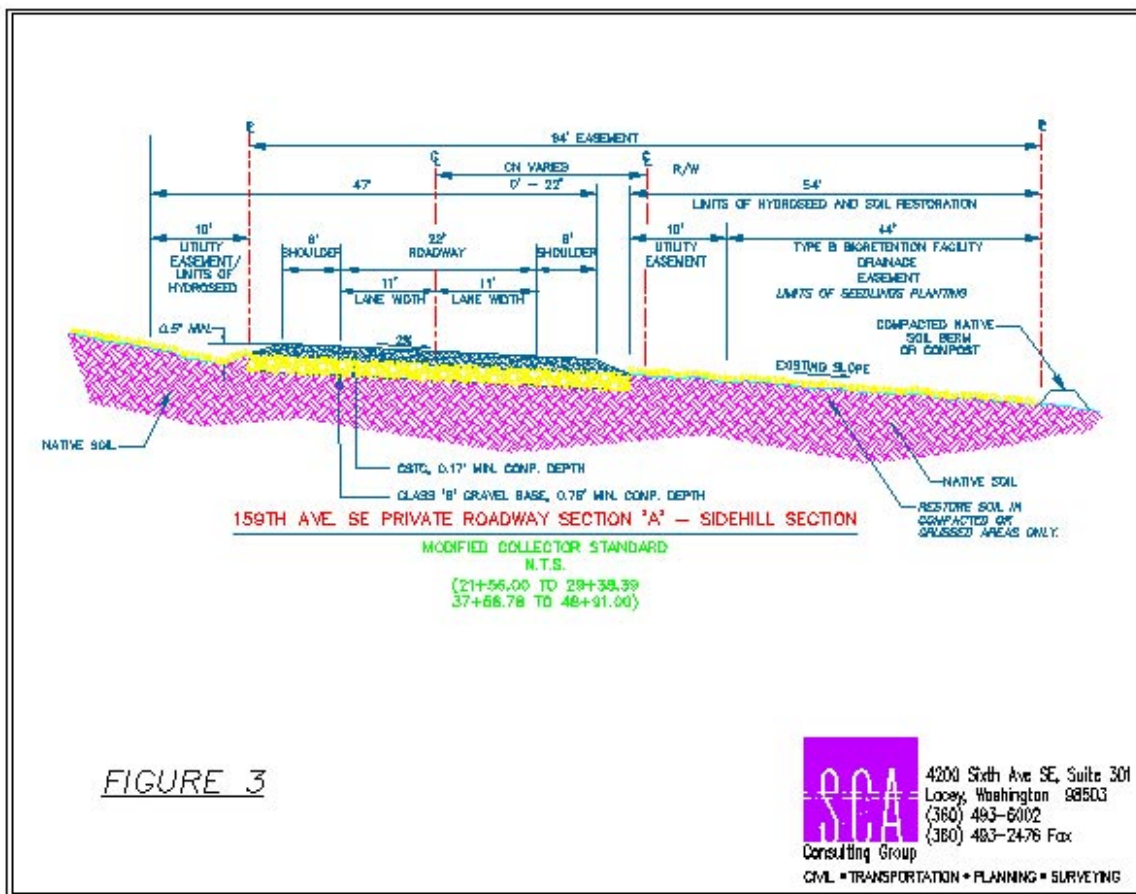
On sloped ground, bioretention facilities should be placed down-gradient of the road implying eccentric location of road centerline within the right-of-way.
